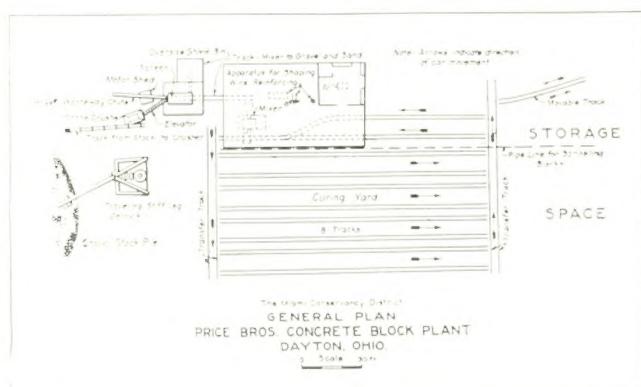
GENERAL PLAN, CONCRETE BLOCK PLANT
